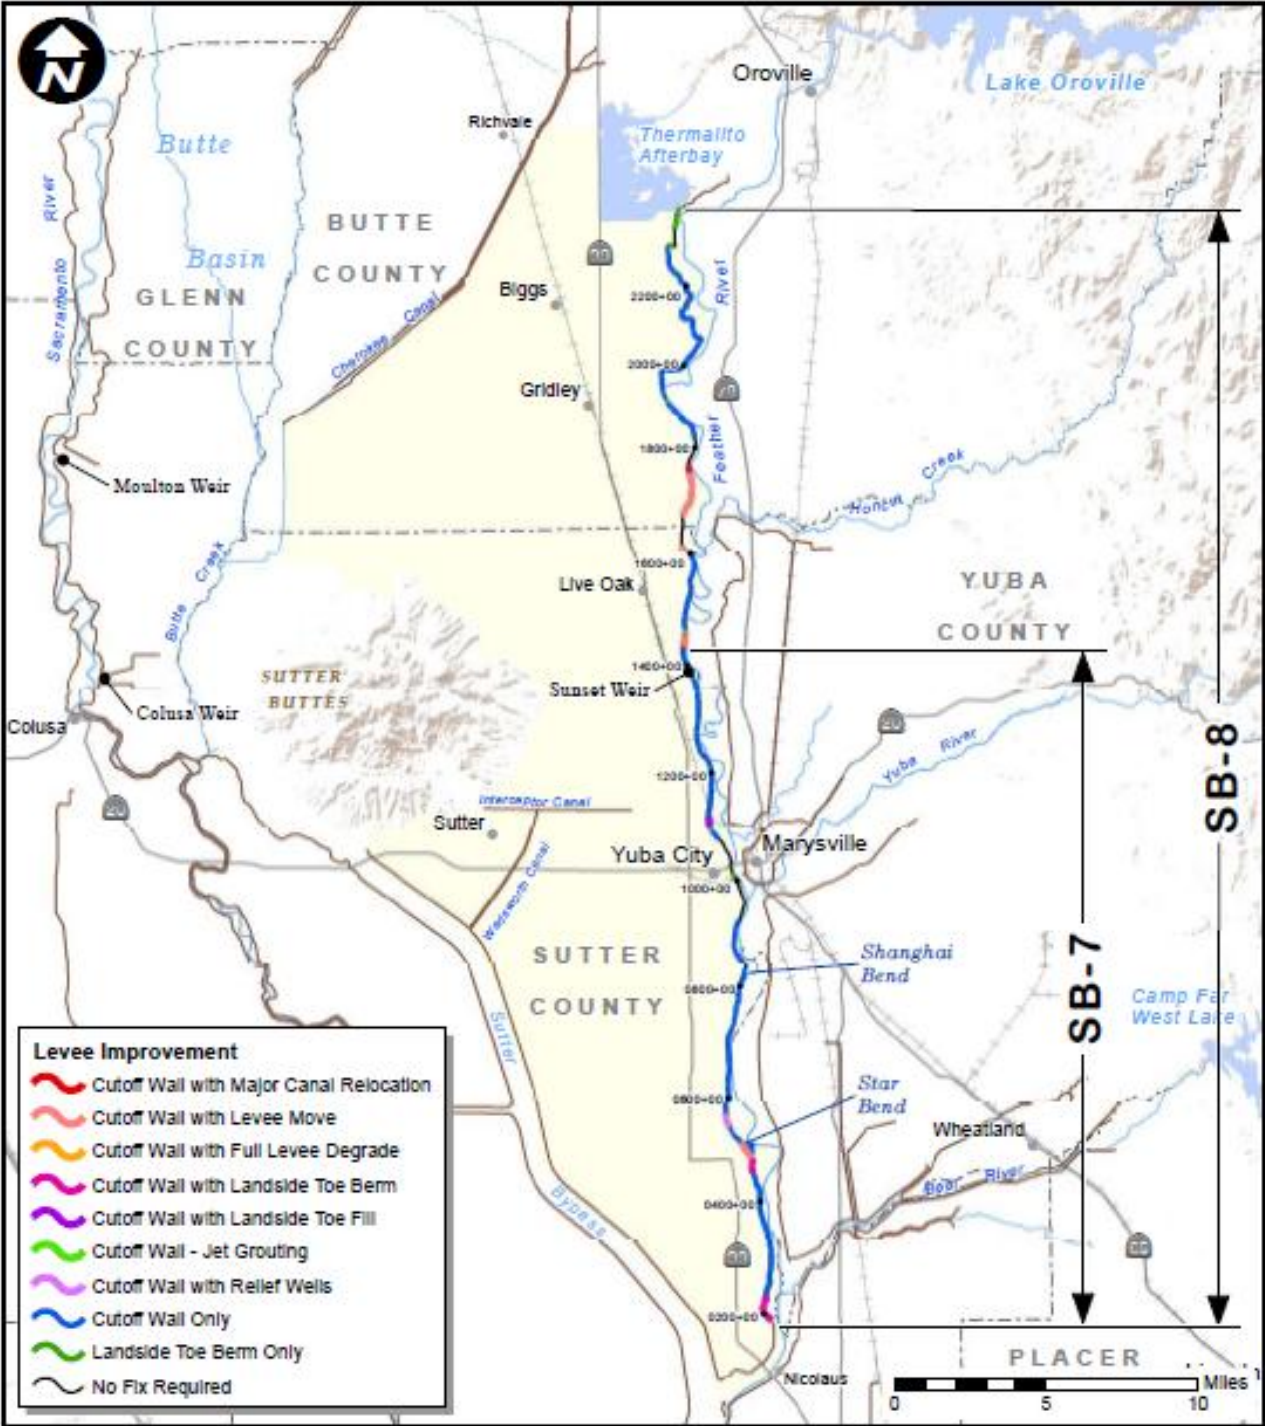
RP (SB-8) Levee Improvement and Proposed Design Feature
